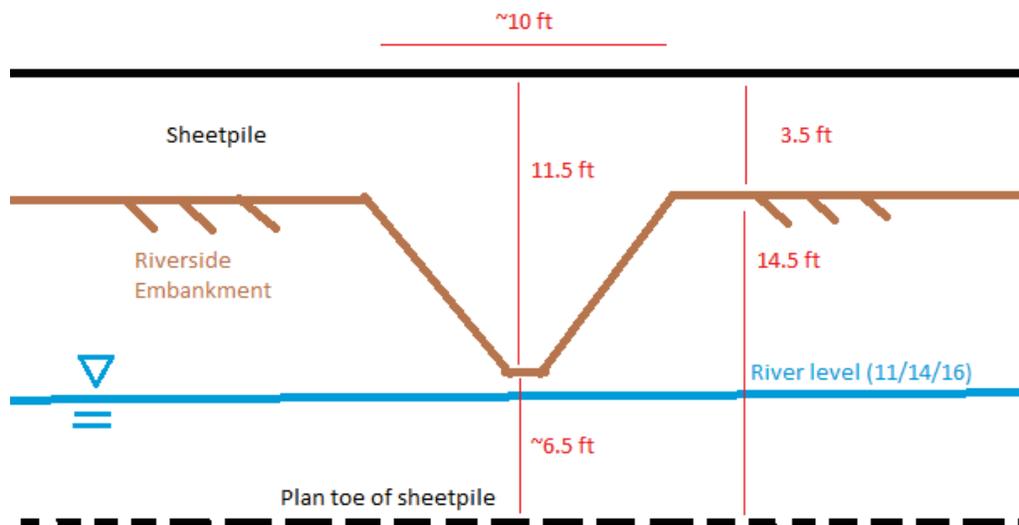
Drawing of worst erosion (Sta. 20+25) view from river
